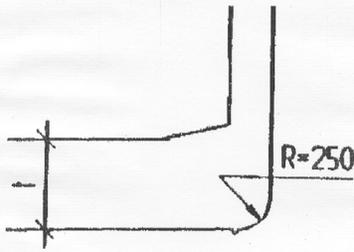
Detail of rounded corner edges to reduce frost attack, chloride penetration, and carbonation of the concrete. (Courtesy of Norwegian Public Roads Administration).
